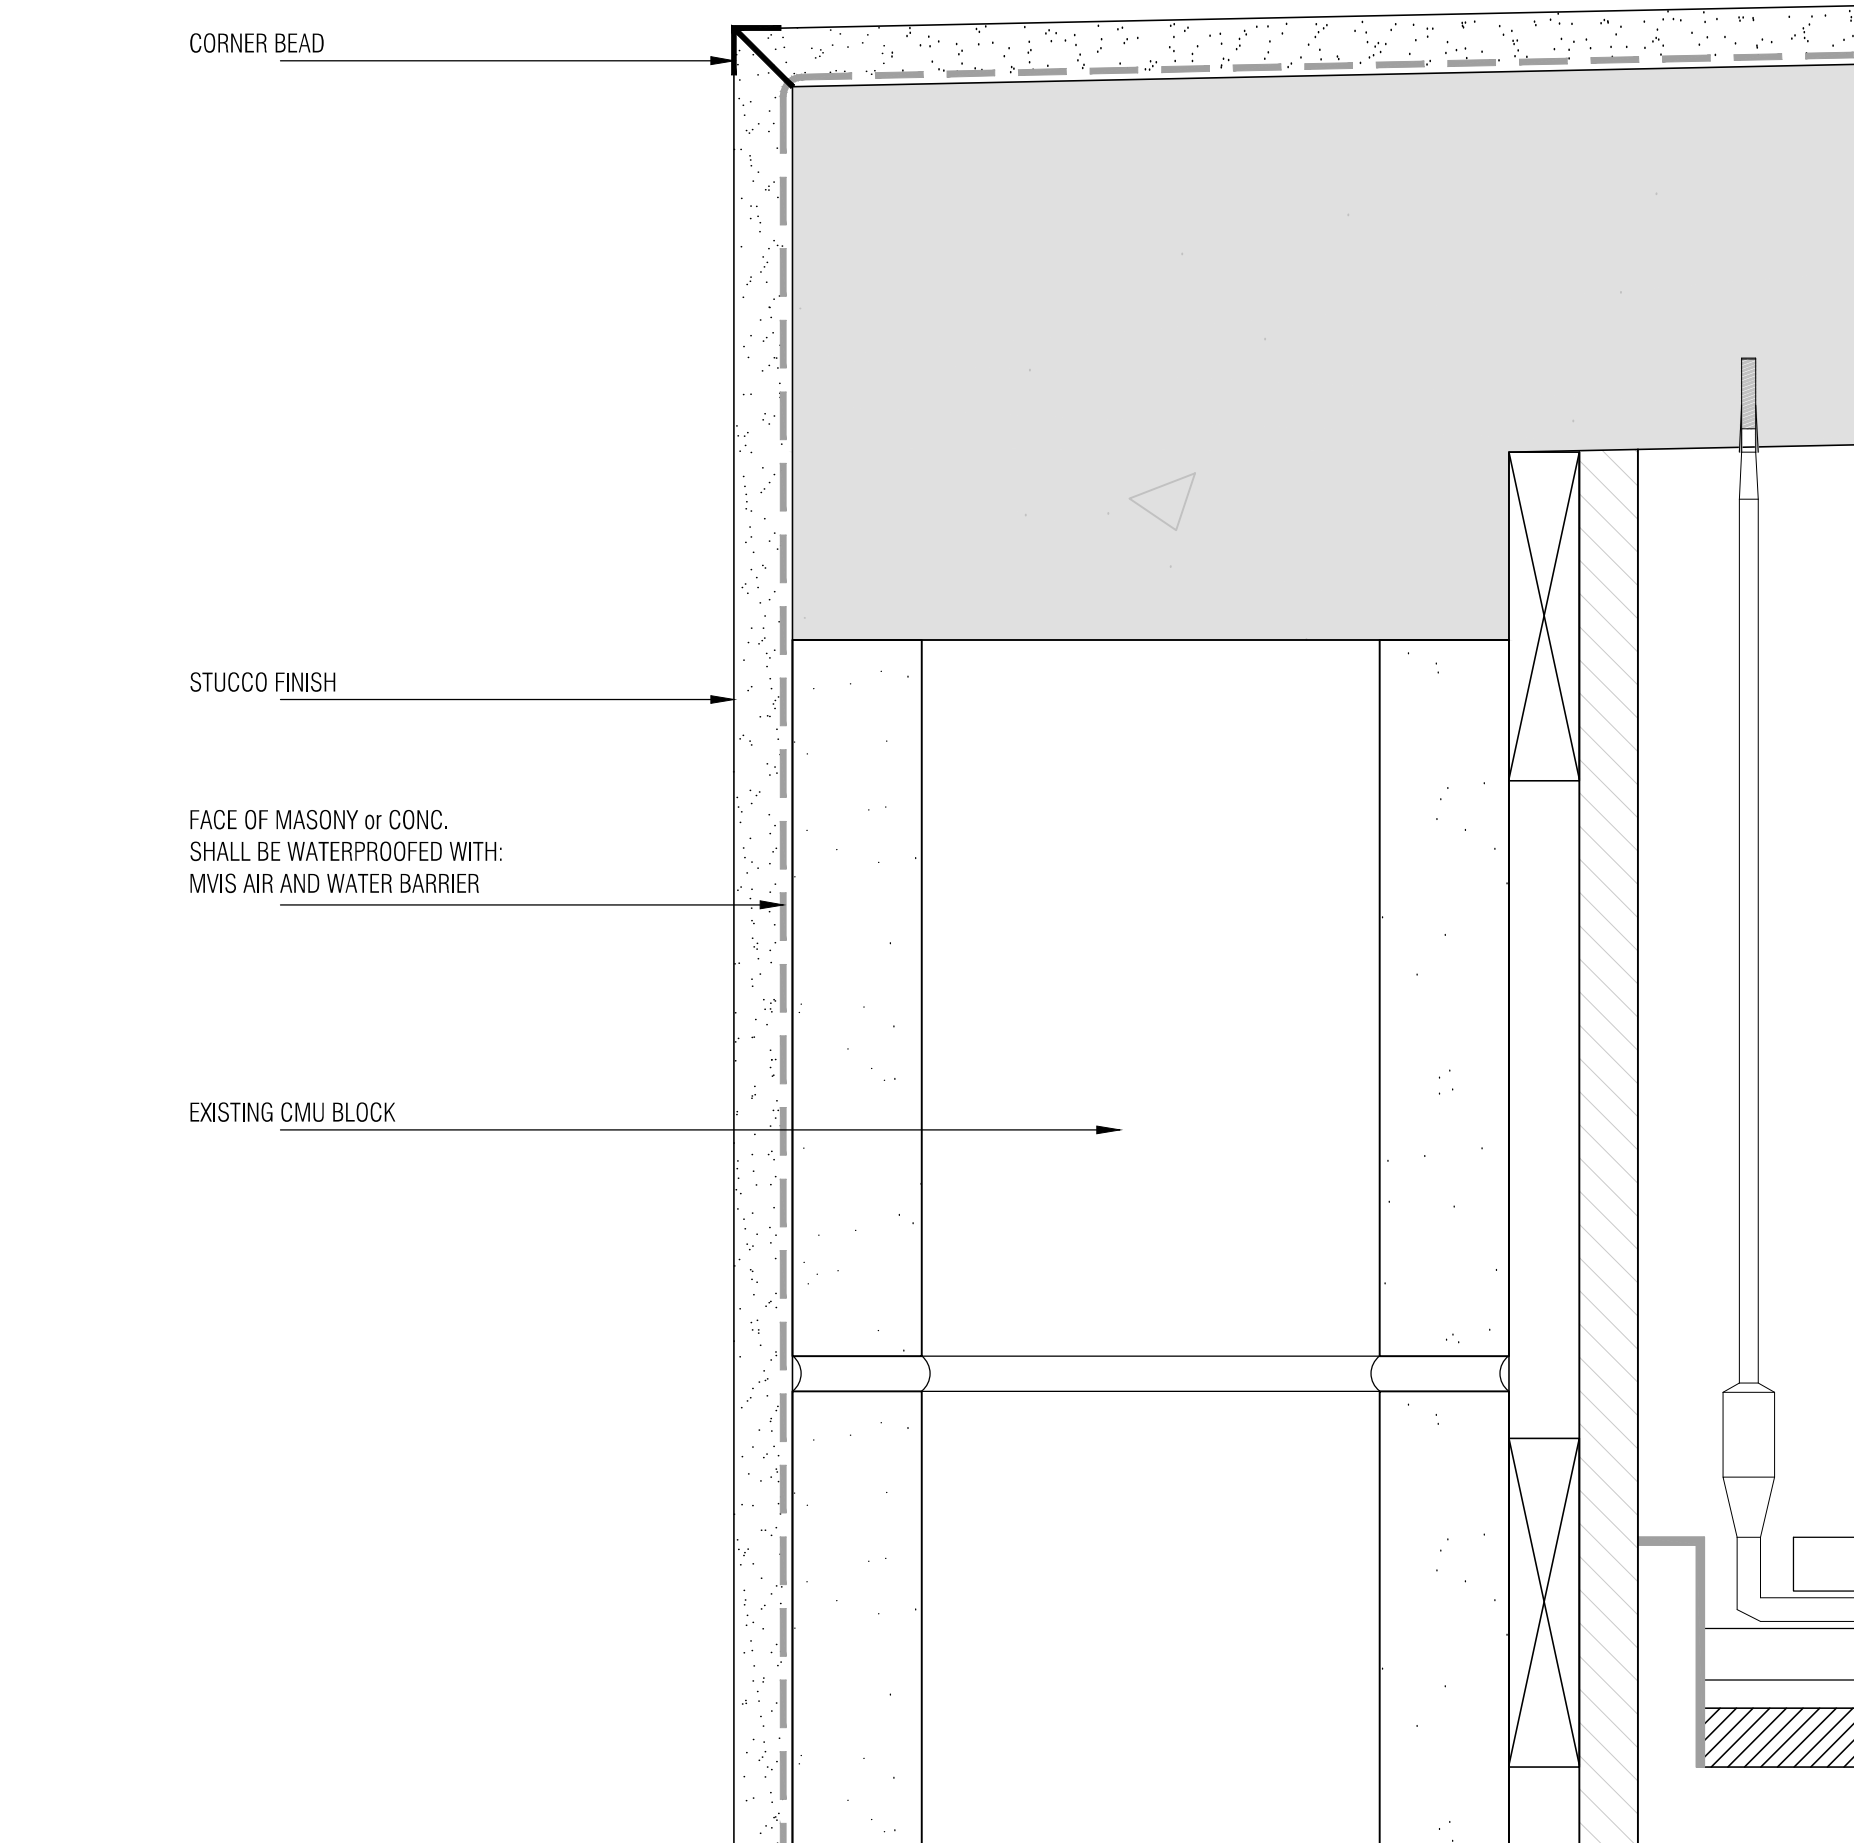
WINDOW SILL & HEADER WATERPROOFING
